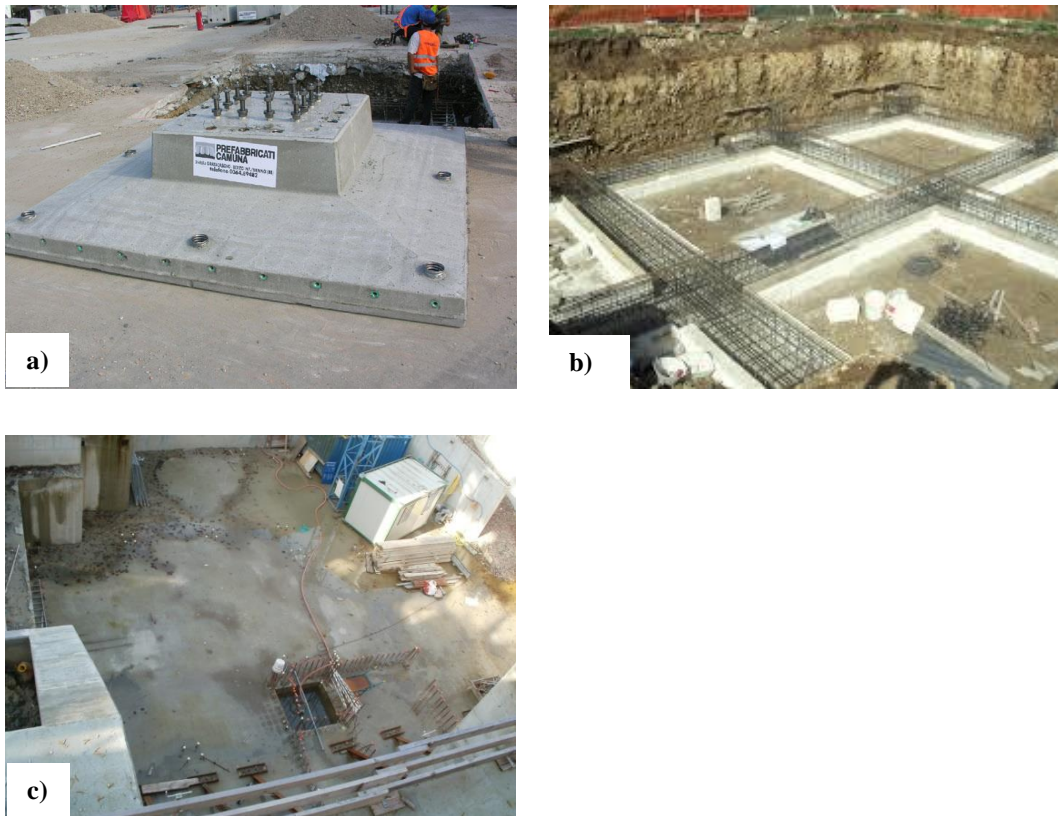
Examples of shallow foundations: a) Pad; b) Strip footing; c) Rafts
